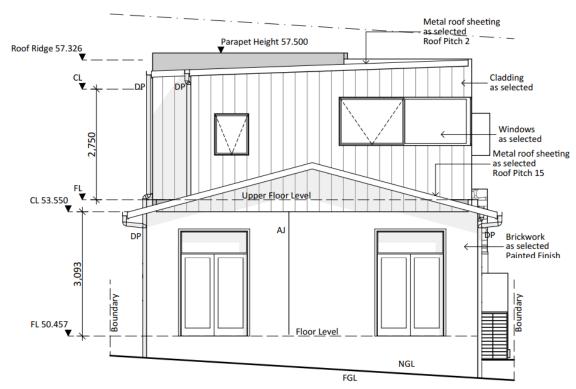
BUILDING ENVELOPE - REAR ELEVATION
